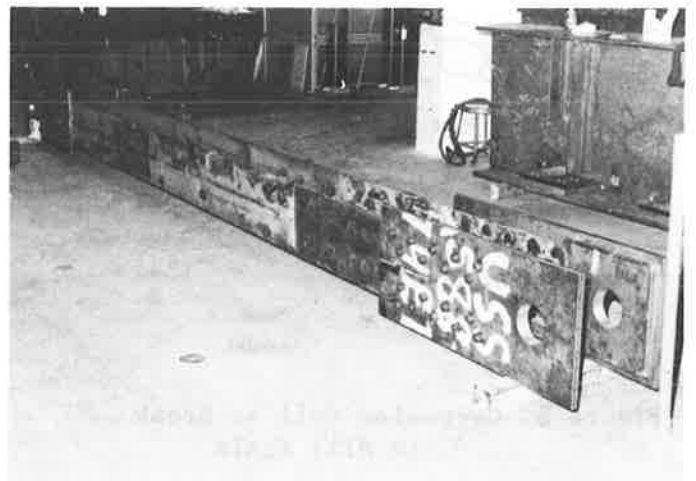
Corroded Hanger Specimen with Bolted End Fixtures
